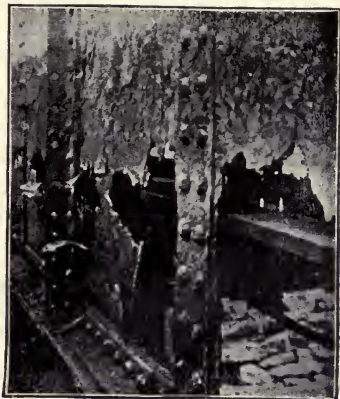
Laminated corrosion of a steel-plate girder on the Washington Street railway bridge in Boston.
